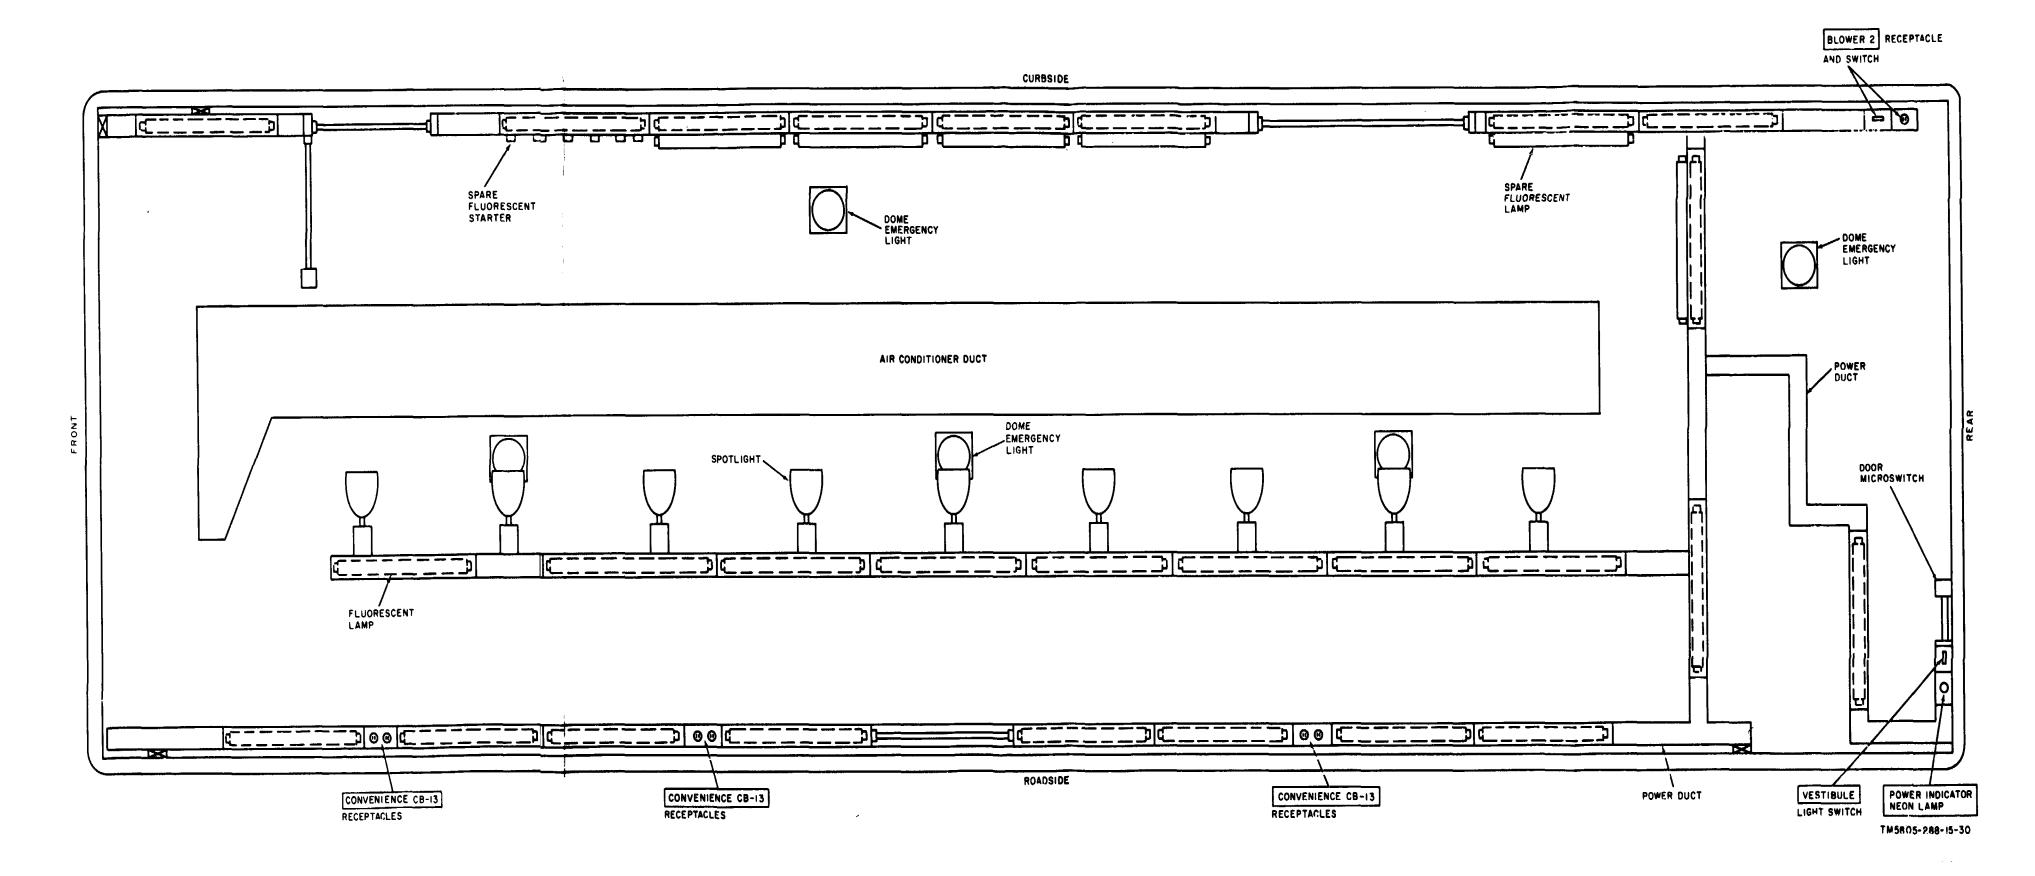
Telephone Switchboard Group AN/MTA-7, ceiling plan.
